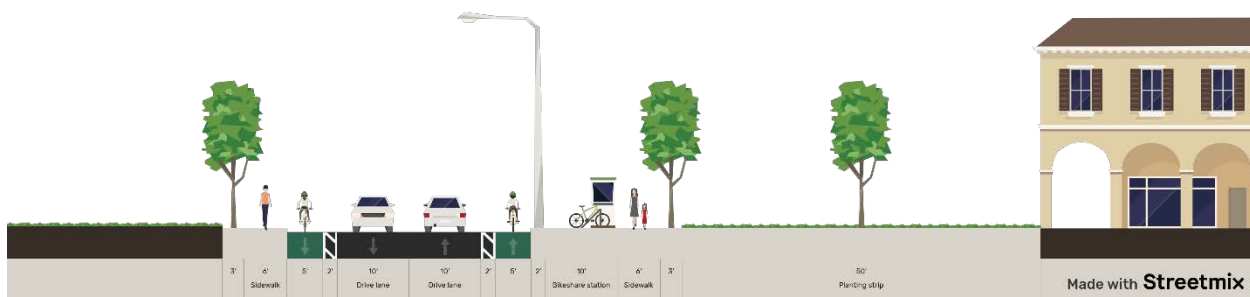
Street cross-section of Wheaton Street looking north from Spencer Elementary School, located 500m south of Blackshear Park. The proposed street has two driving lanes and bike lanes on both sides. In addition, adding the bike-share
